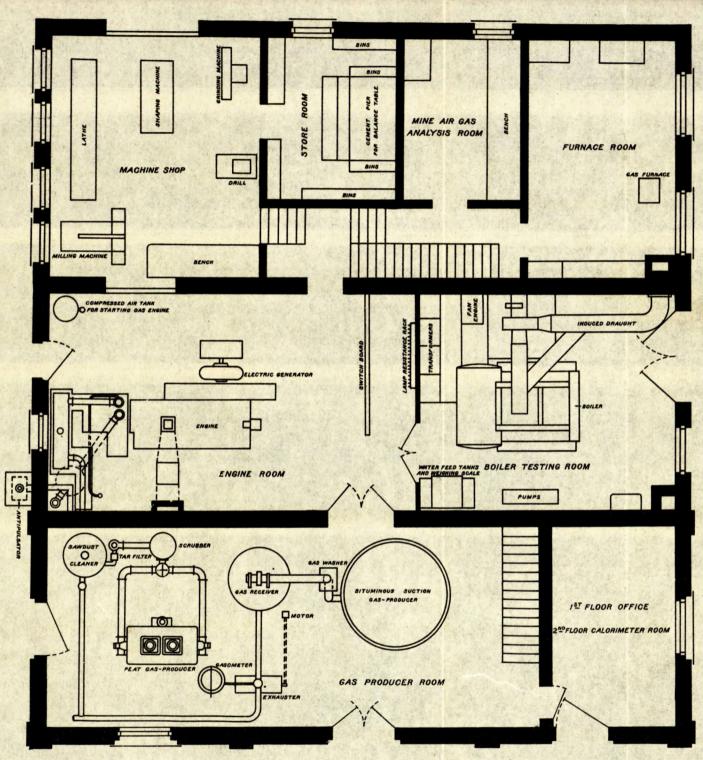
, Plan of Ground Floor, Fuel Testing Station, Ottawa.
